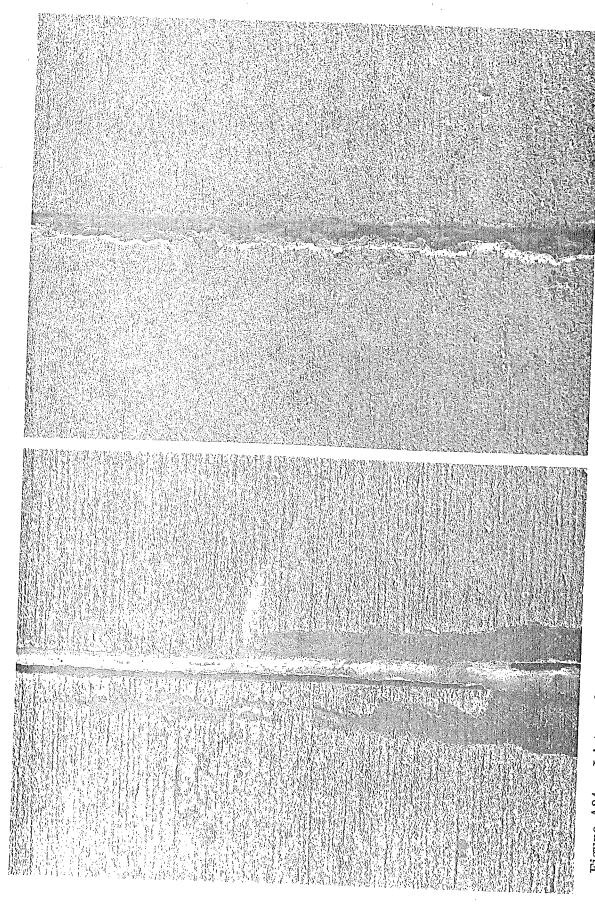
Joint seal adhesion failure. A bond failure between joint seal and the face of the joint seal groove.
